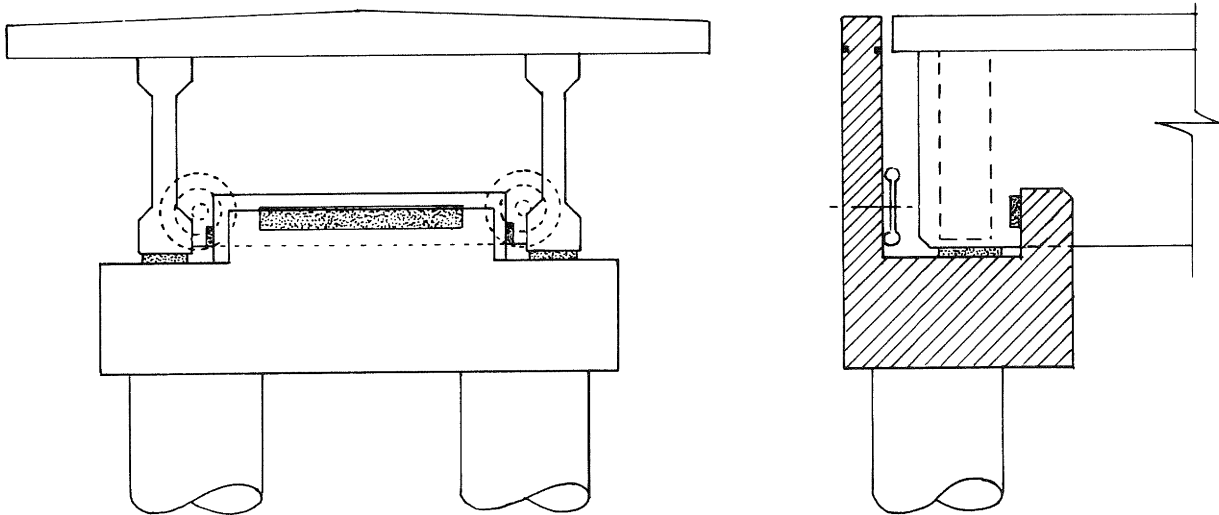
ALTERNATIVE ABUTMENT LINKAGE
